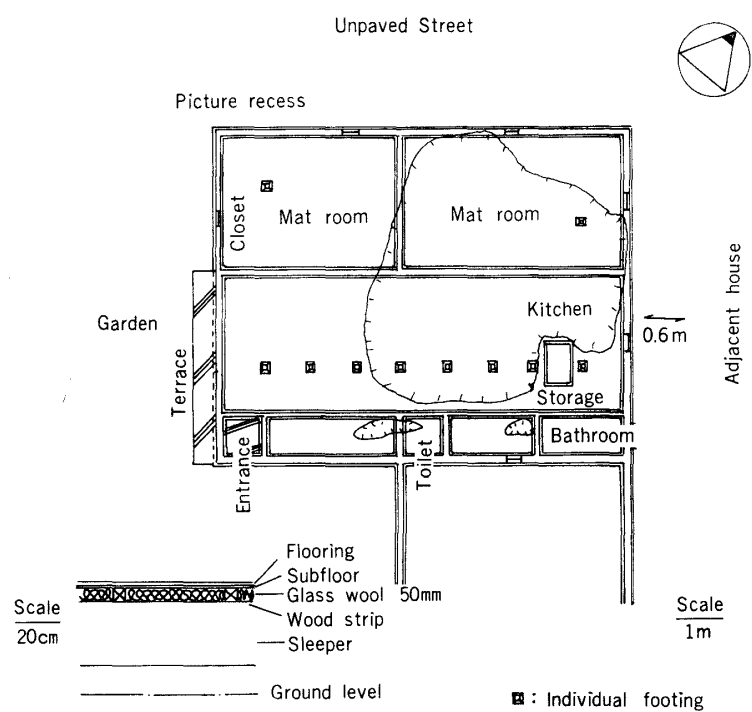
The foundation plan and the details of the floor constitution (Case 2).
